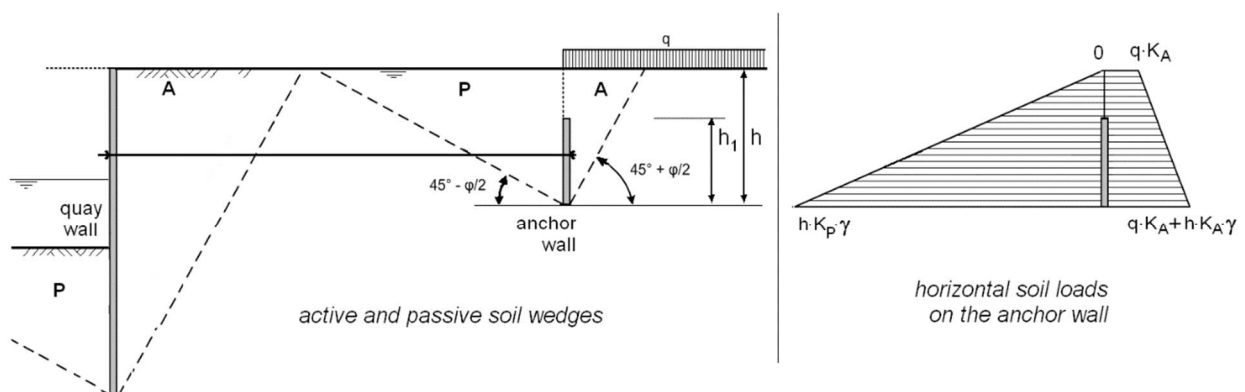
Unfavourable location of surcharge next to an anchor wall
